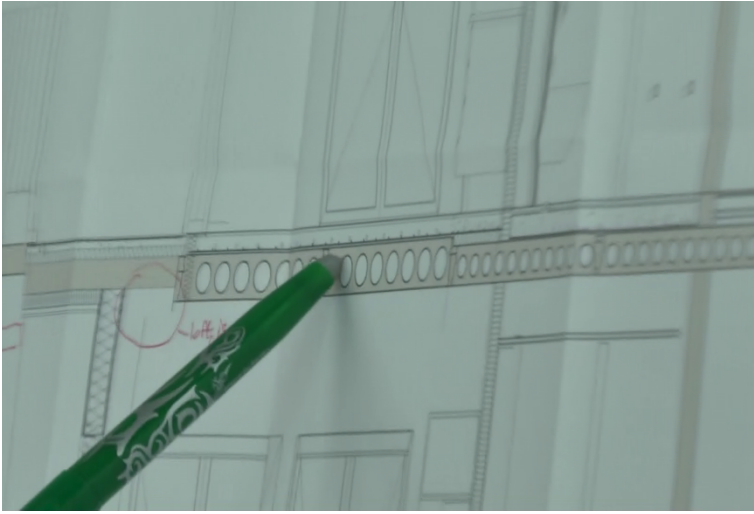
The picture shows how the construction engineer points at the floor construction with his pen.
